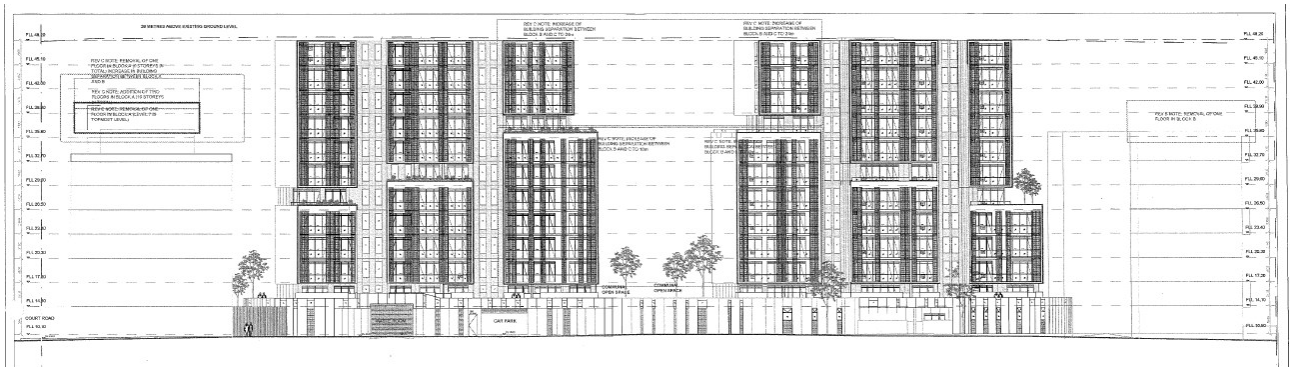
Approved south elevation of development facing the adjoining Alan Street properties.
